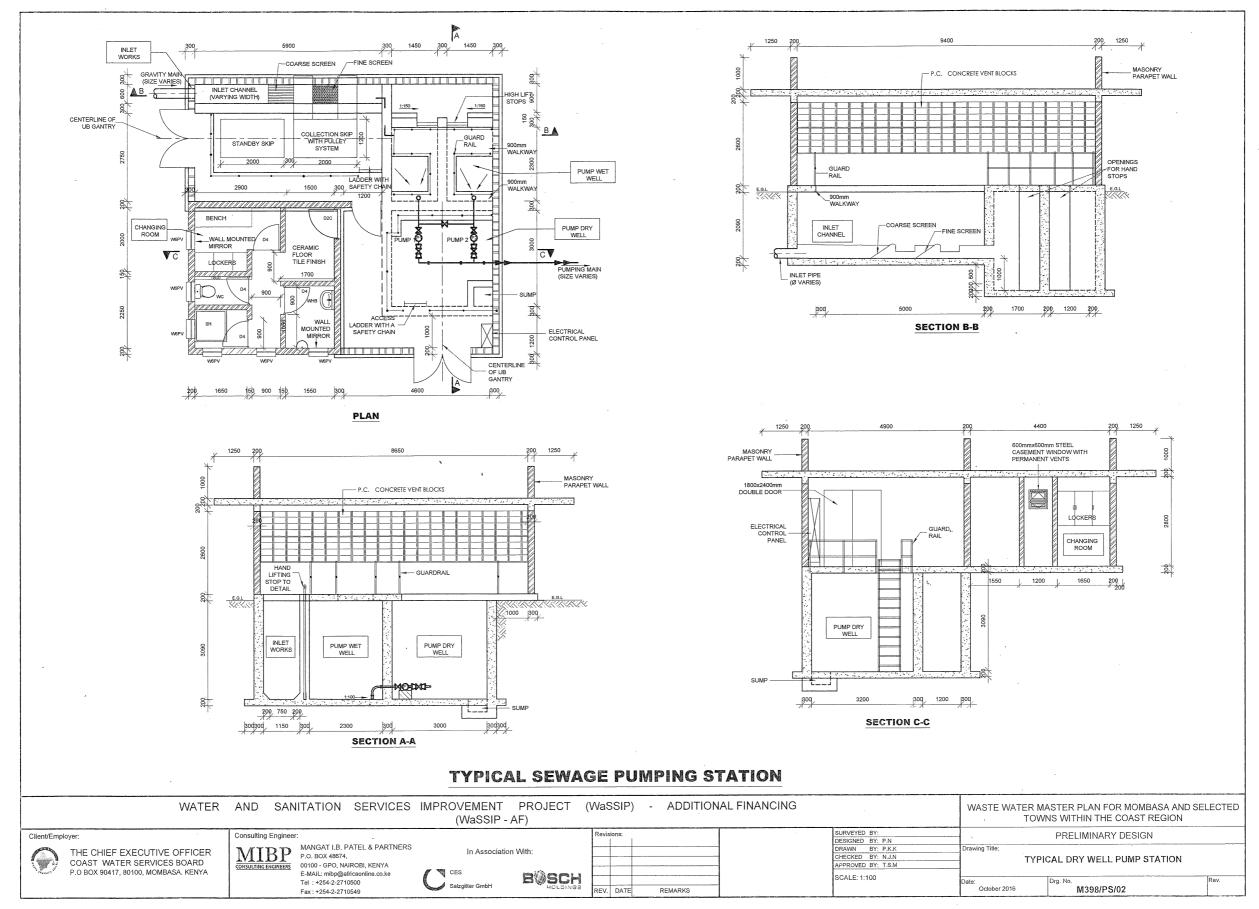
Layout Plan and Sections of a Centrifugal Pumping Station
